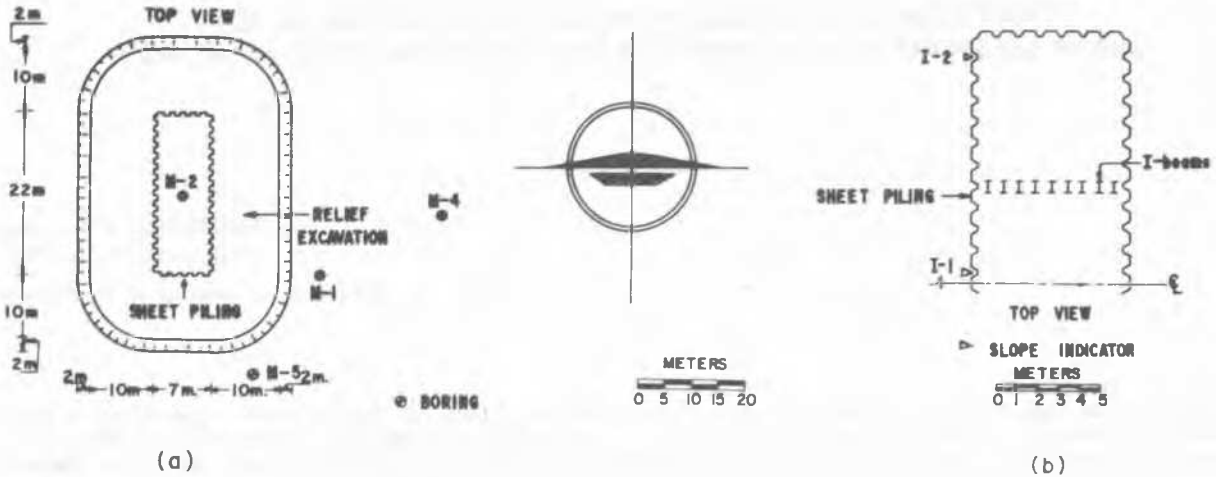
(a) SITE LAYOUT AND LOCATION OF SOIL BORINGS.
